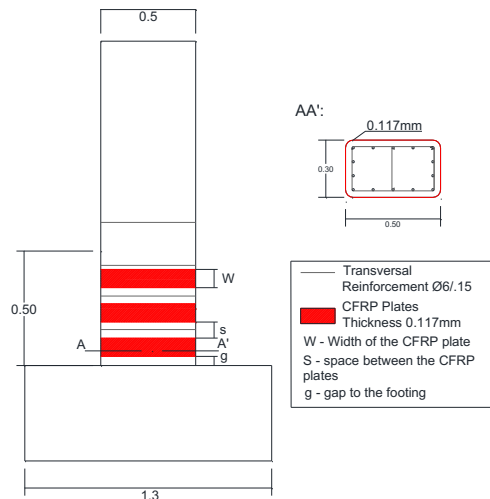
Strengthened column specimen with CFRP plates jacketing.
